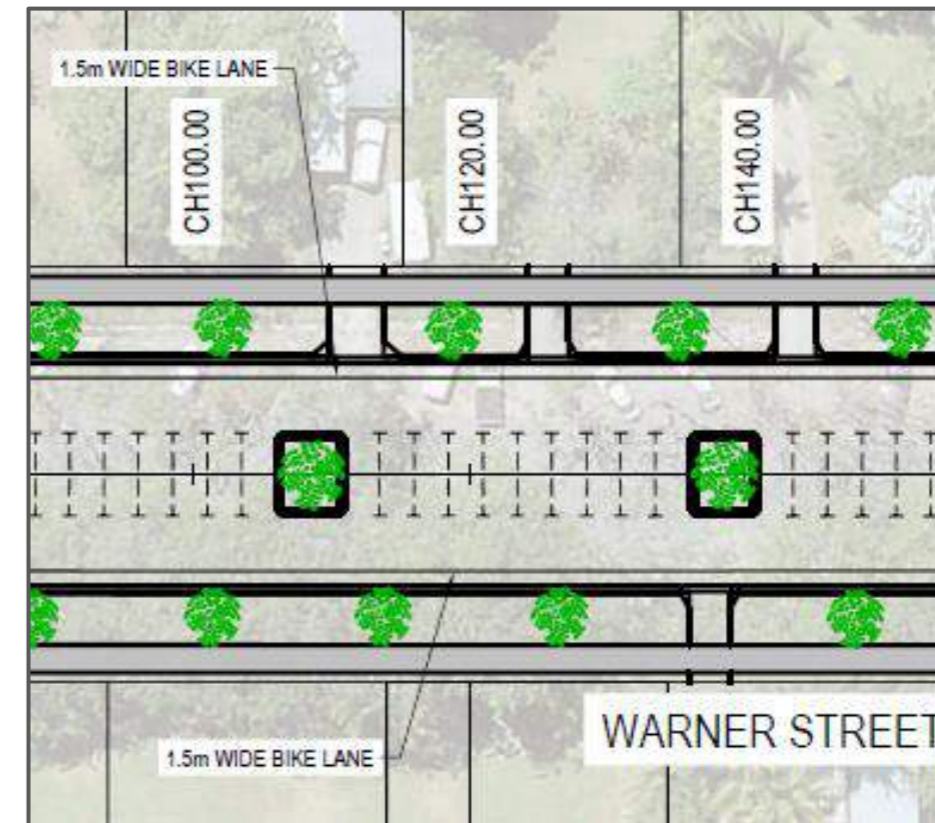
Snapshot from Drawing Q184018-001-CI-4001 refer to Page 18a and 18b for plans and sections
